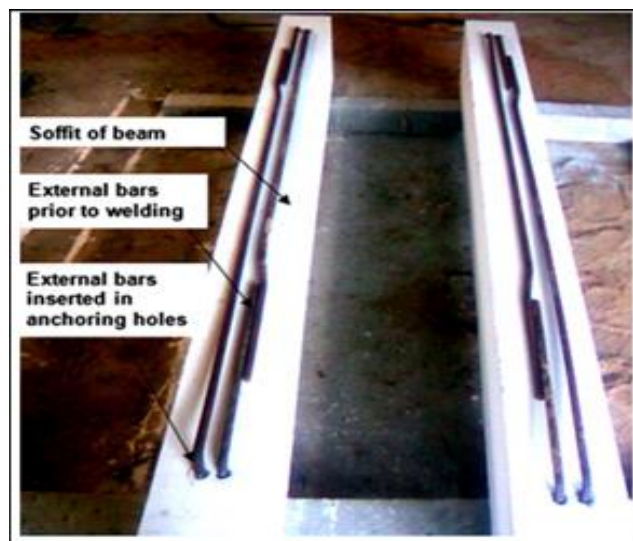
External Bars at Beam Soffit Prior to Welding and Anchoring
